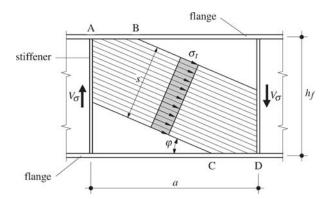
Schematic representation of a diagonal tie in the web panel of a plate girder.
